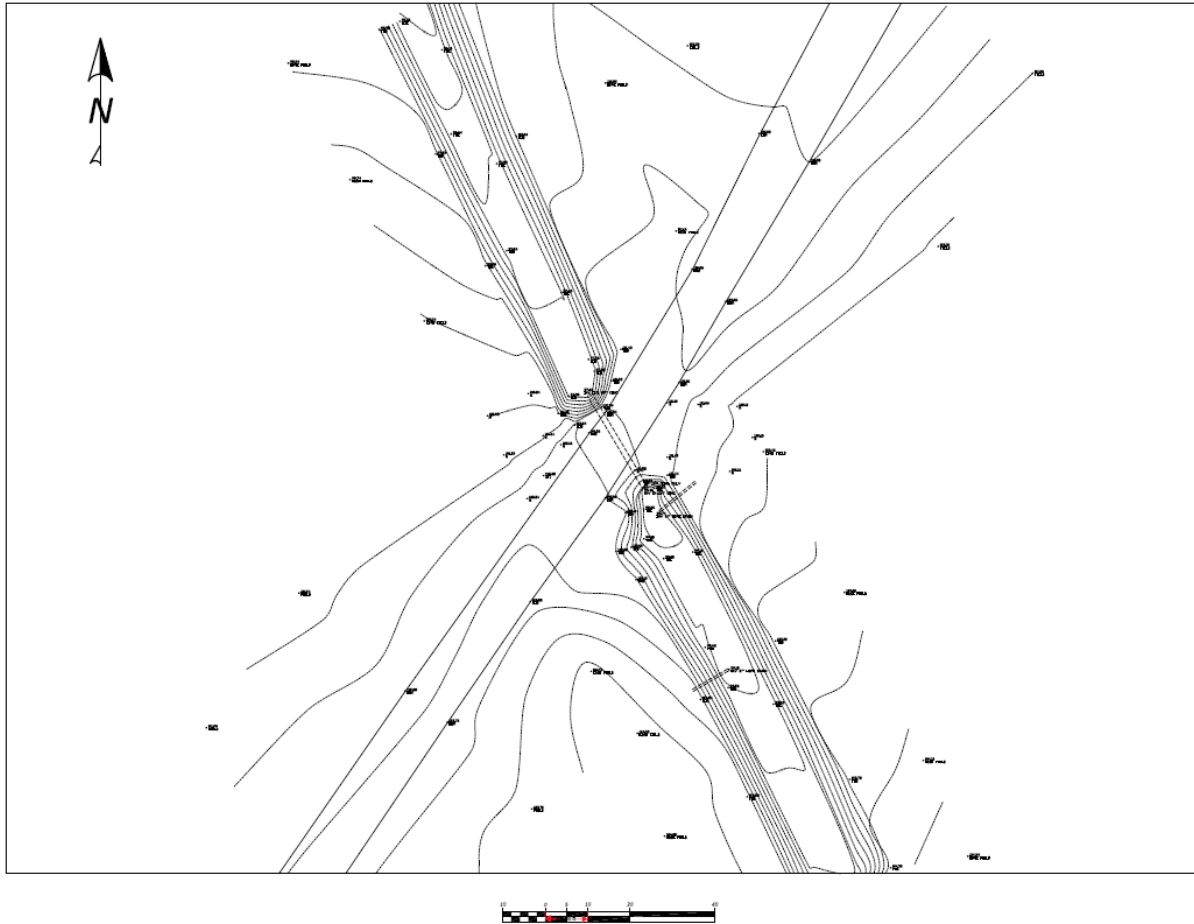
Surveyed conditions at study site. Note two tile inlets to a central ditch connected by a culvert under an access road.
